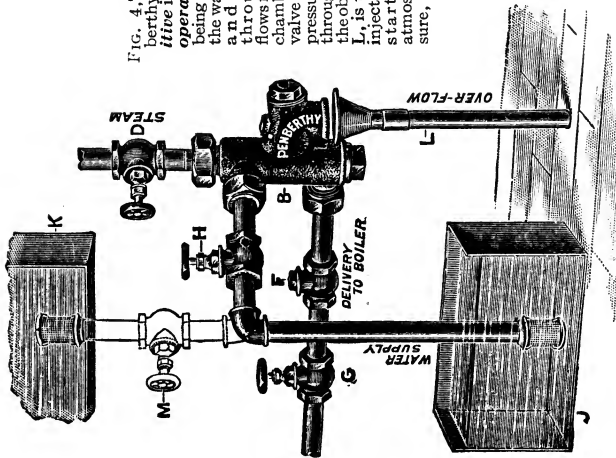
,797.—Penberthy single tube fixed nozzle lifting automatic injector with connections. B, injector; D, globe valve in steam pipe; F, check valve in delivery pipe; G, globe valve in suction pipe; J, water supply taken from below injector; K, water supply taken from overhead tank; L, waste pipe from overflow; M, second globe valve in water supply pipe where an overhead tank is used or supply is taken from water works pressure.
